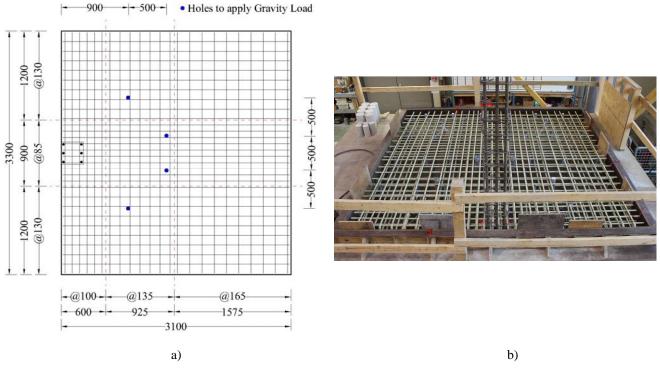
Typical details of test connections (dimensions in mm): (a) top reinforcement mesh layout, (b) reinforcement configuration.
